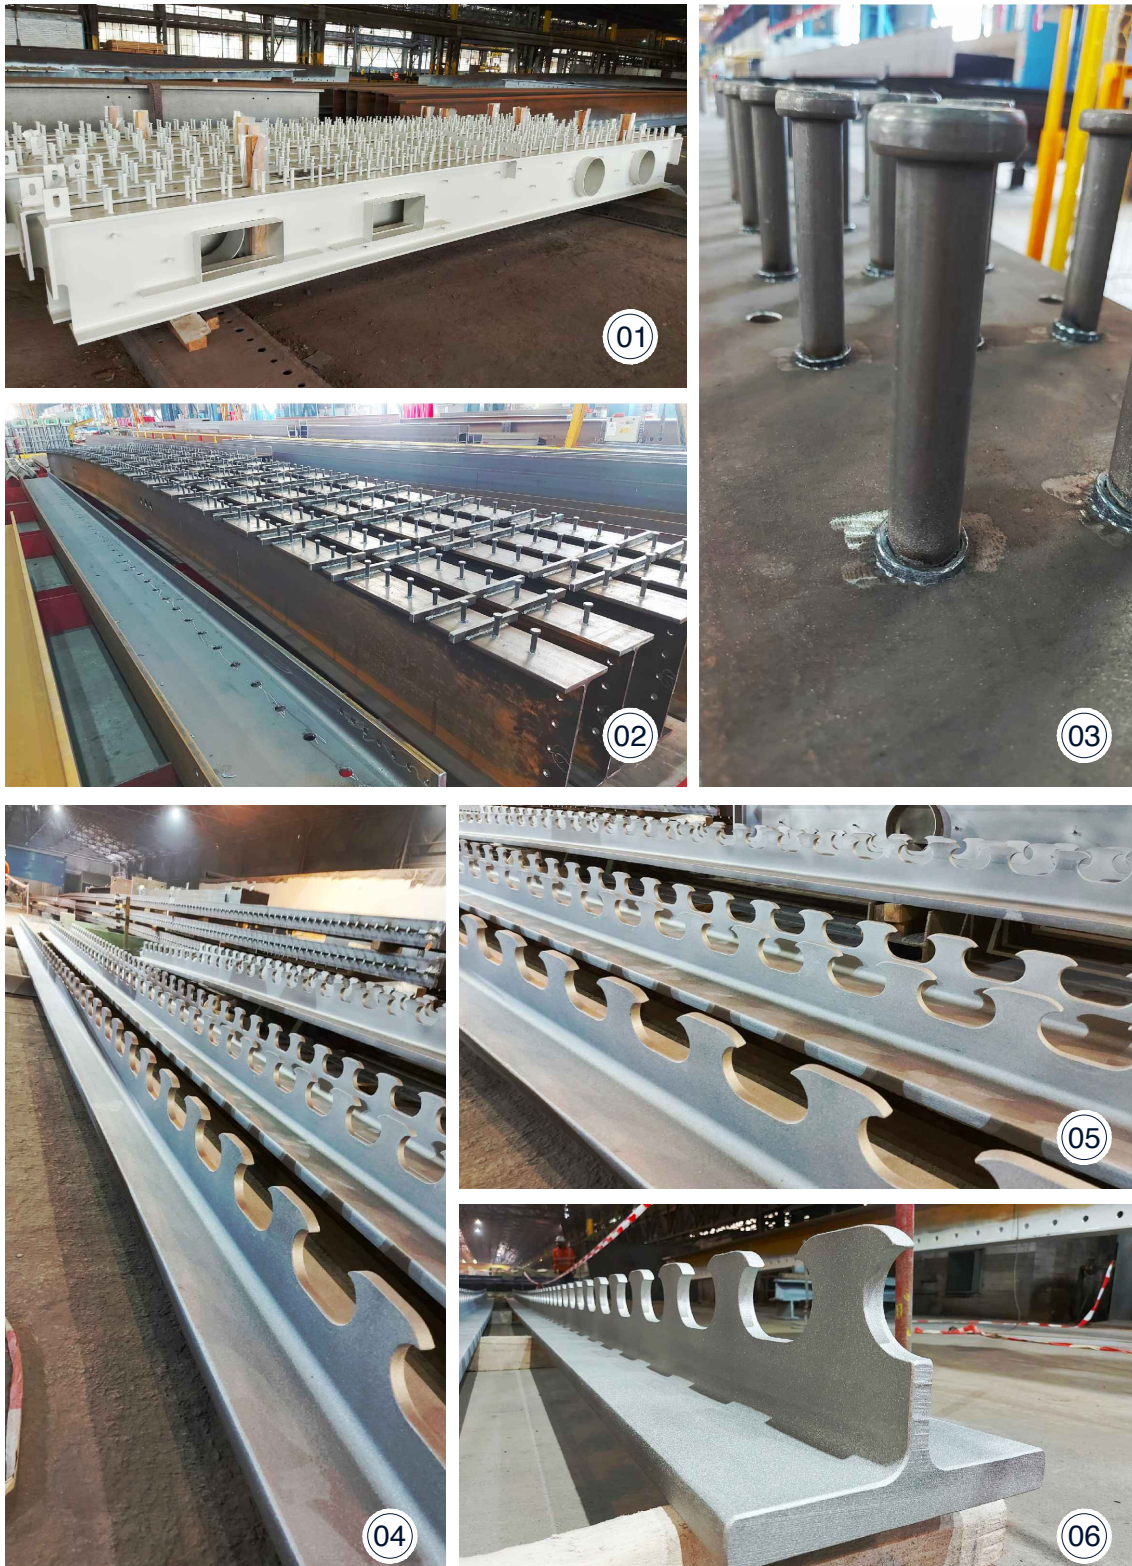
some pictures of the visits I took at the hot-rolling plant and beam finishing center plant: 01) a partial encased beam for a building project in preparation; 02) a set of car park beams with welded headed studs and bars; 03) headed studs shear connectors; 04), 05) and 06) a set of composite dowels beams with Modified Clothoidal Shape (MCL) type thermal cutting
